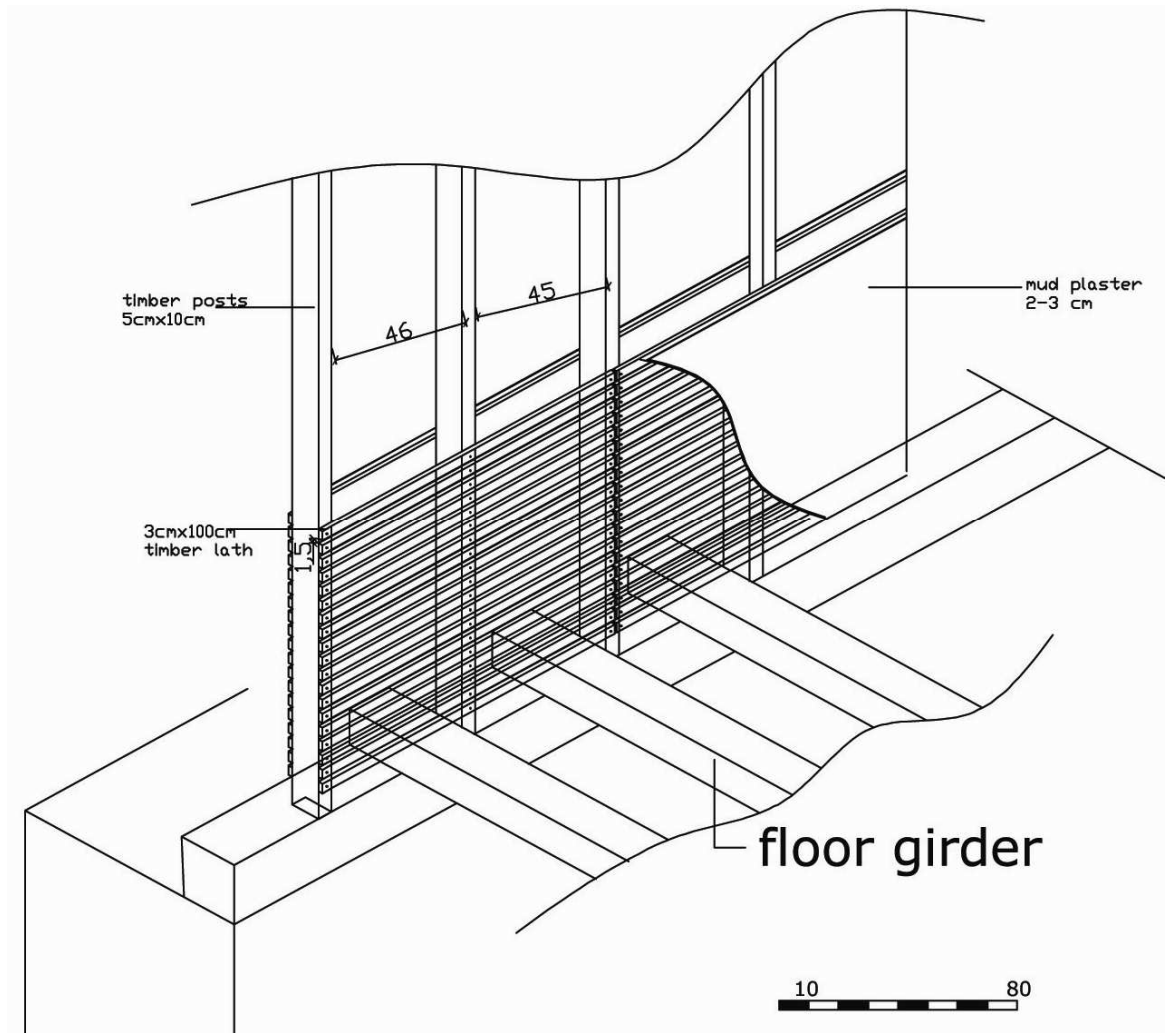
24 Drawing of the timber wall type 5. Çelik 2008.
